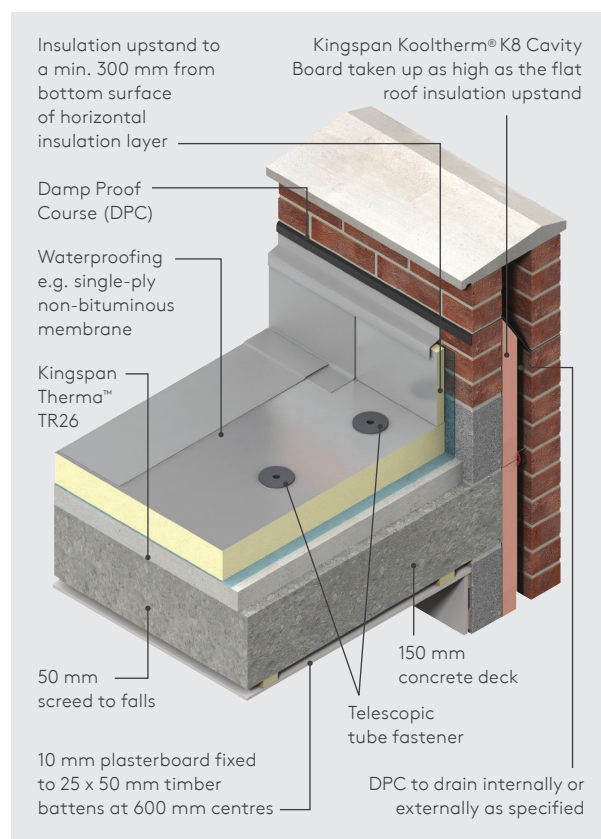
Kingspan Therma™ TR26 in a Dense Concrete Deck with Suspended Ceiling.
